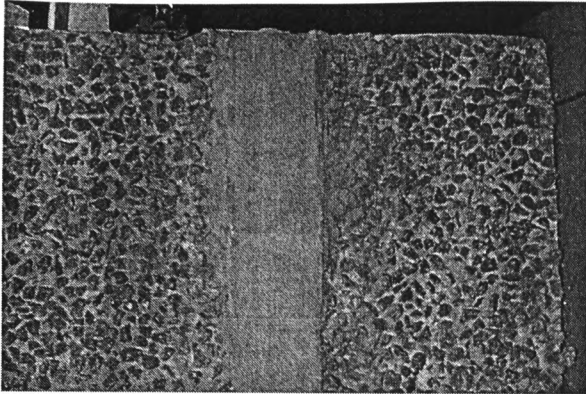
40 mm concrete slab with 10 cm wide concrete stripe
